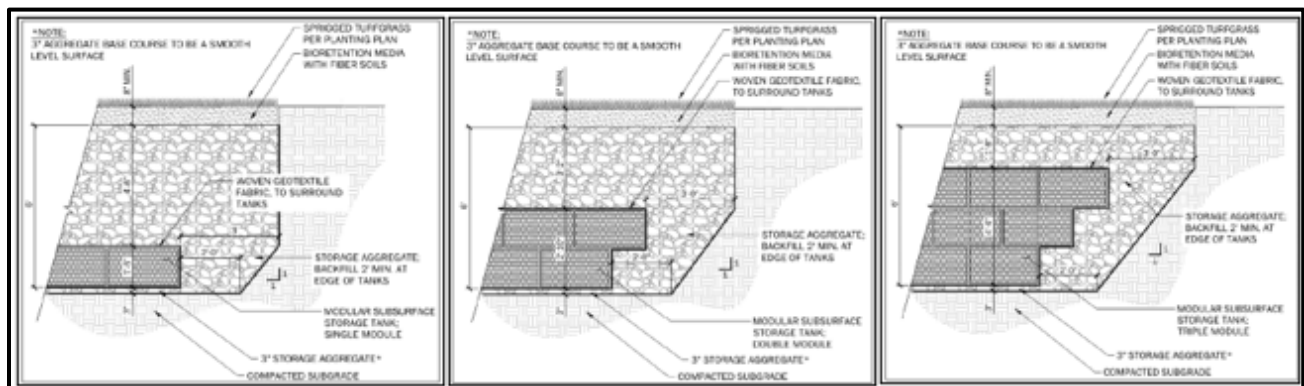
Stormwater Park Section Profiles One (1), Two (2), & Three (3) Storage Tanks
